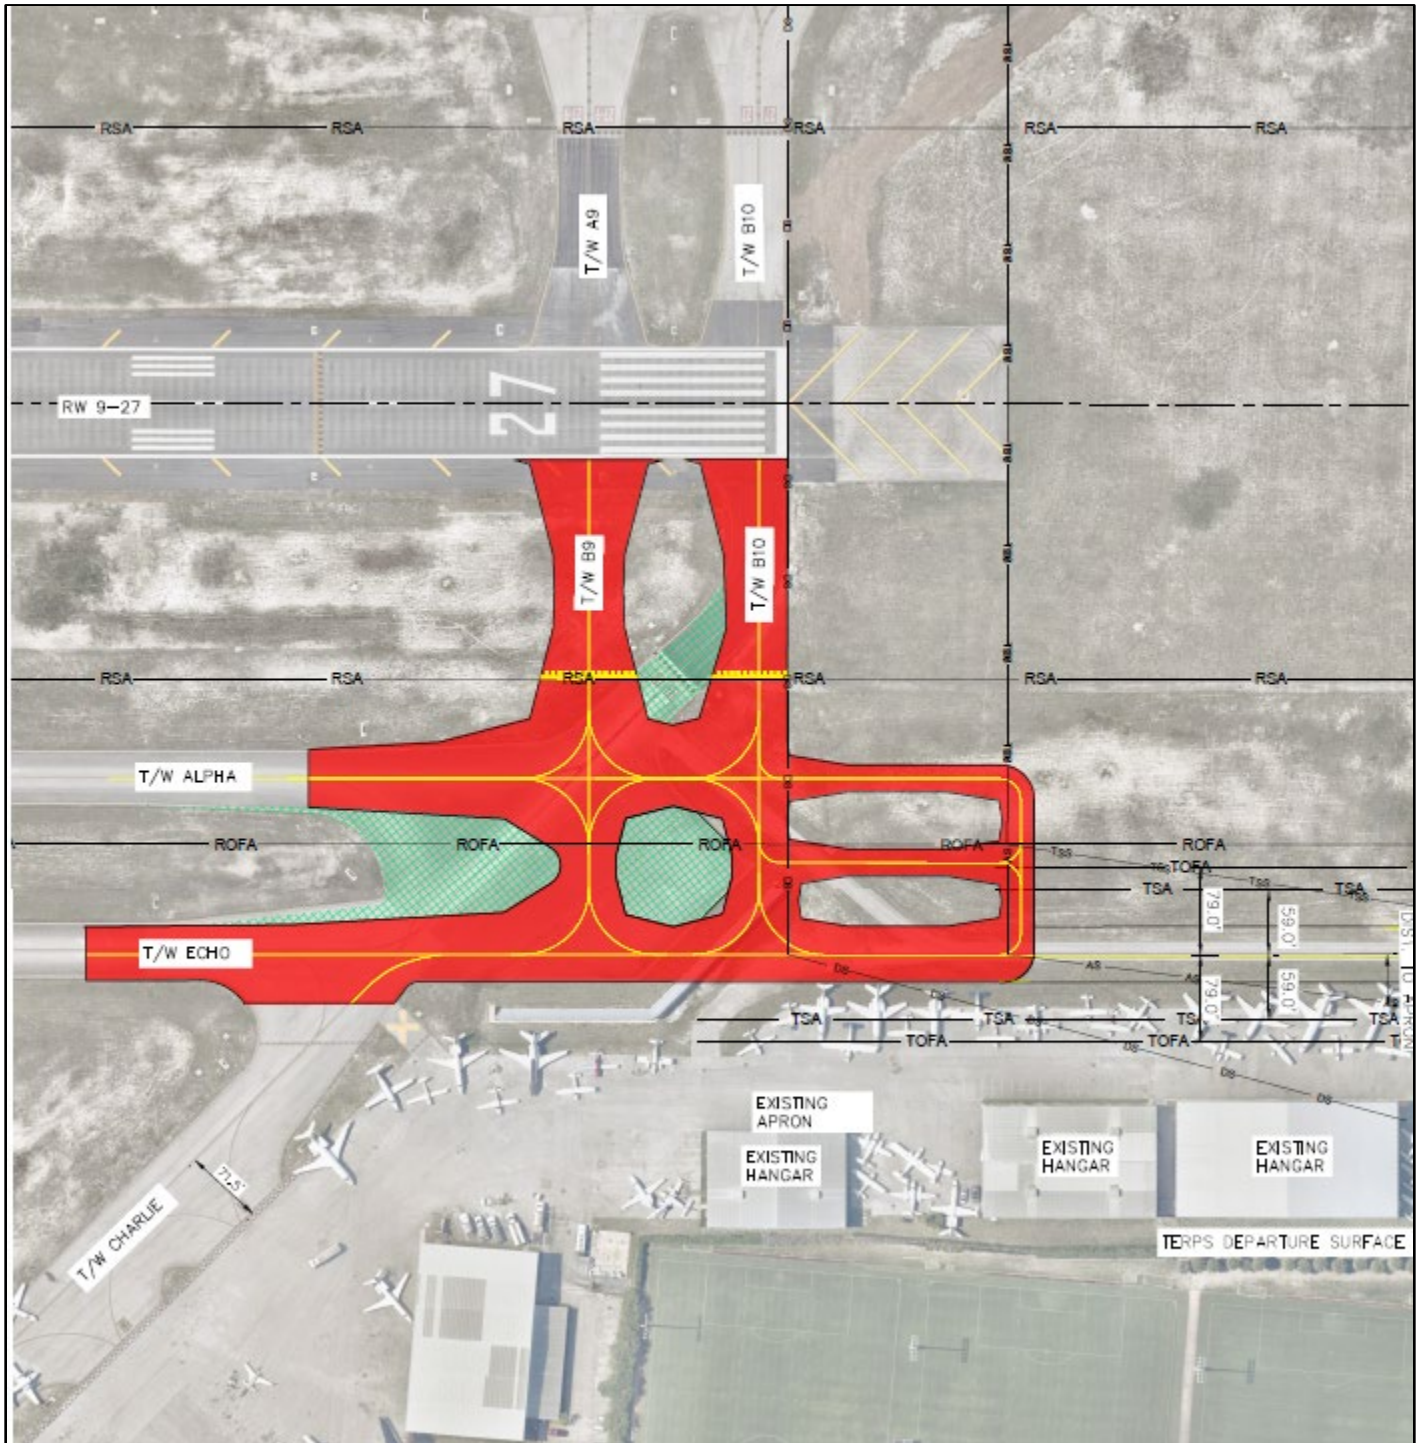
Runway 27 Bypass Taxiway and Run-Up Area Location
